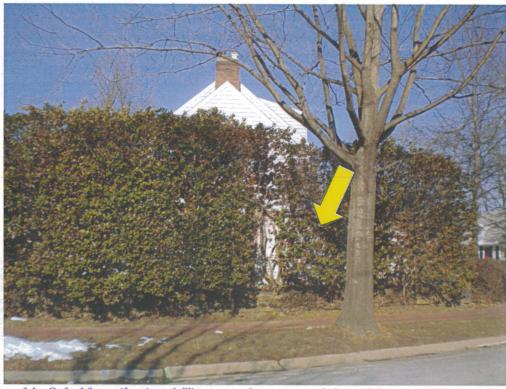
View of the Oxford Street (front) yard. The proposed generator and air conditioner would be located behind the hedge and would not encroach forward of the front (Oxford Street) building restriction line.
